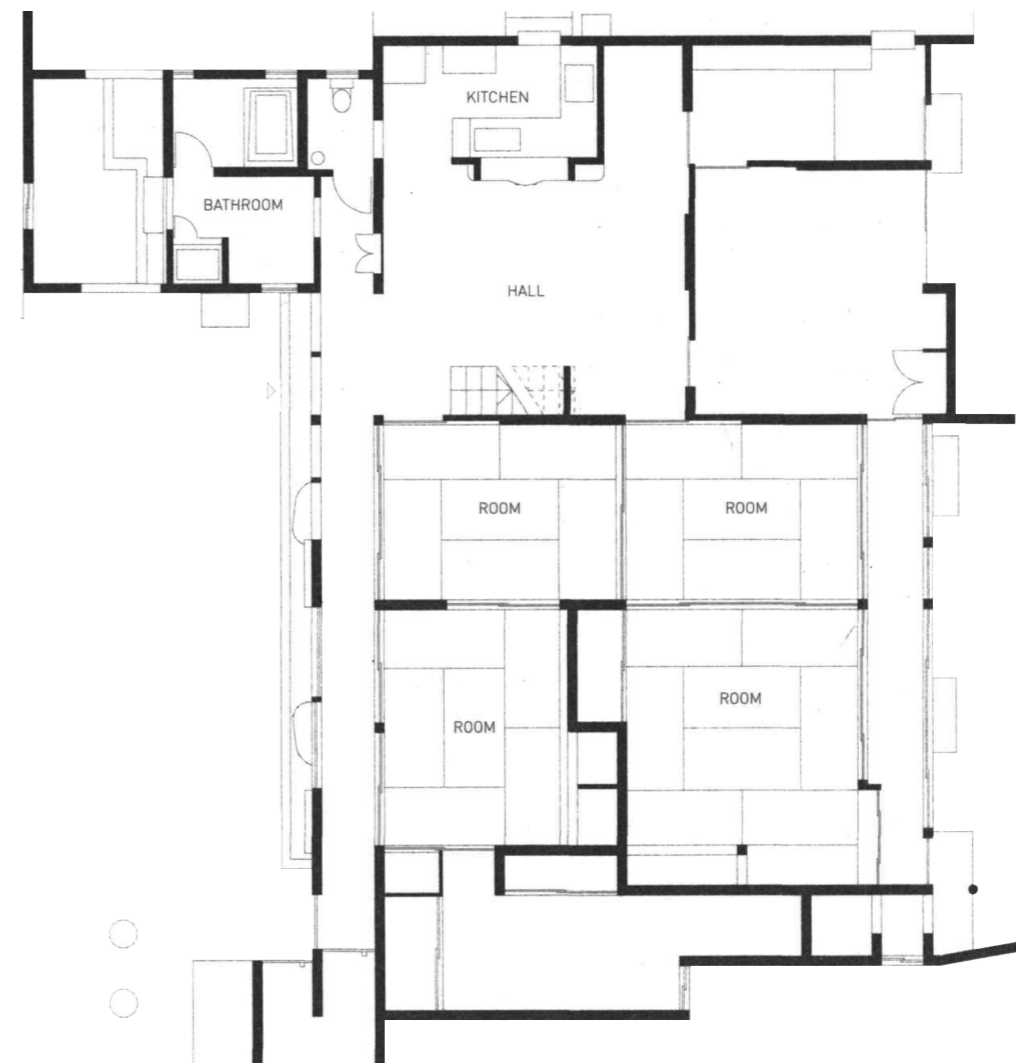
Traditional Japanese House floor plan (Kazuhiko + Kaoru Obayashi, 1850)
